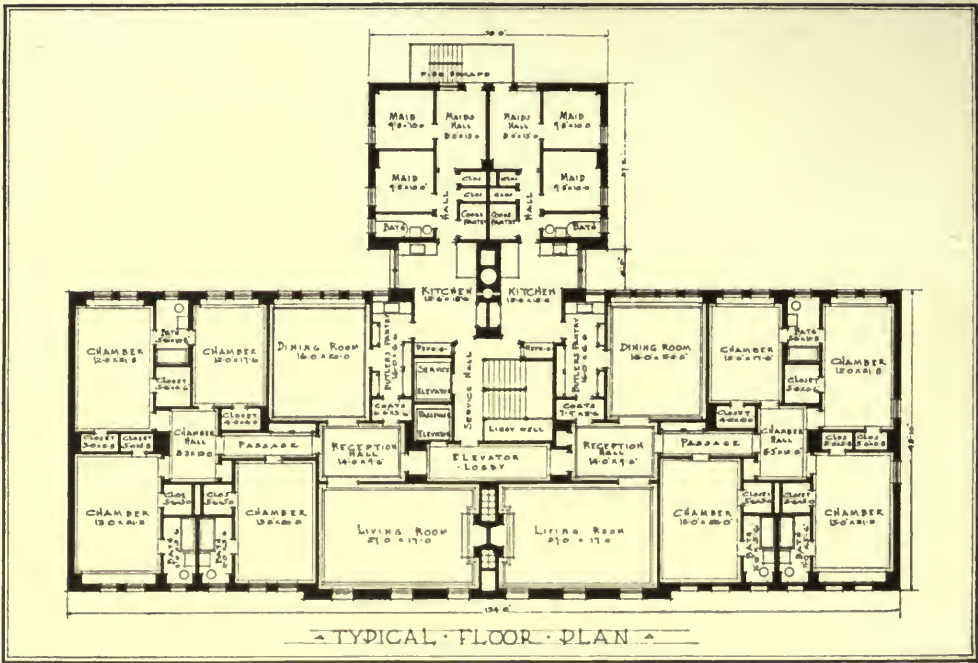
TYPICAL FLOOR PLAN—NO. 230 EAST WALTON PLACE, CHICAGO, ILL.
